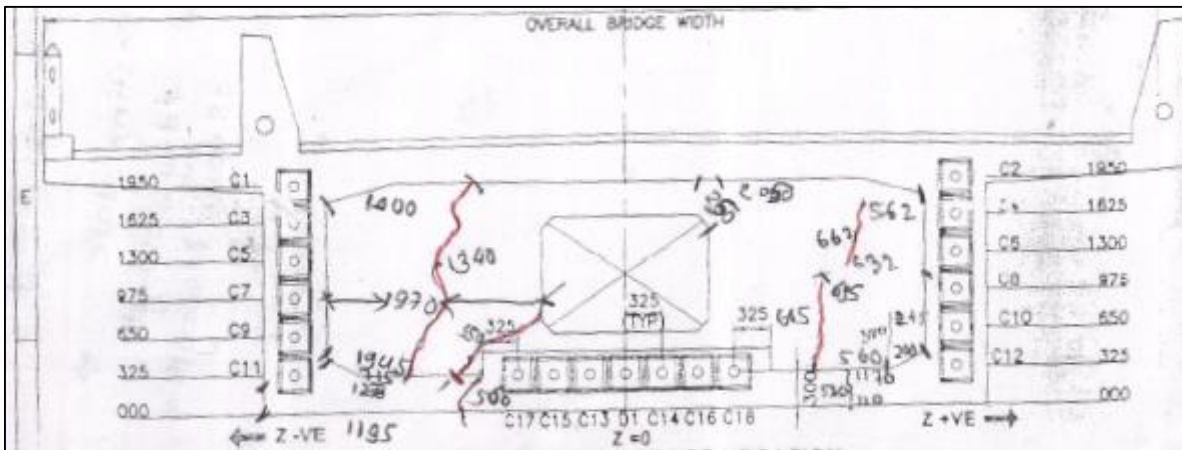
Cracks Marked in Drawing at Diaphragm Wall of Pier Side
